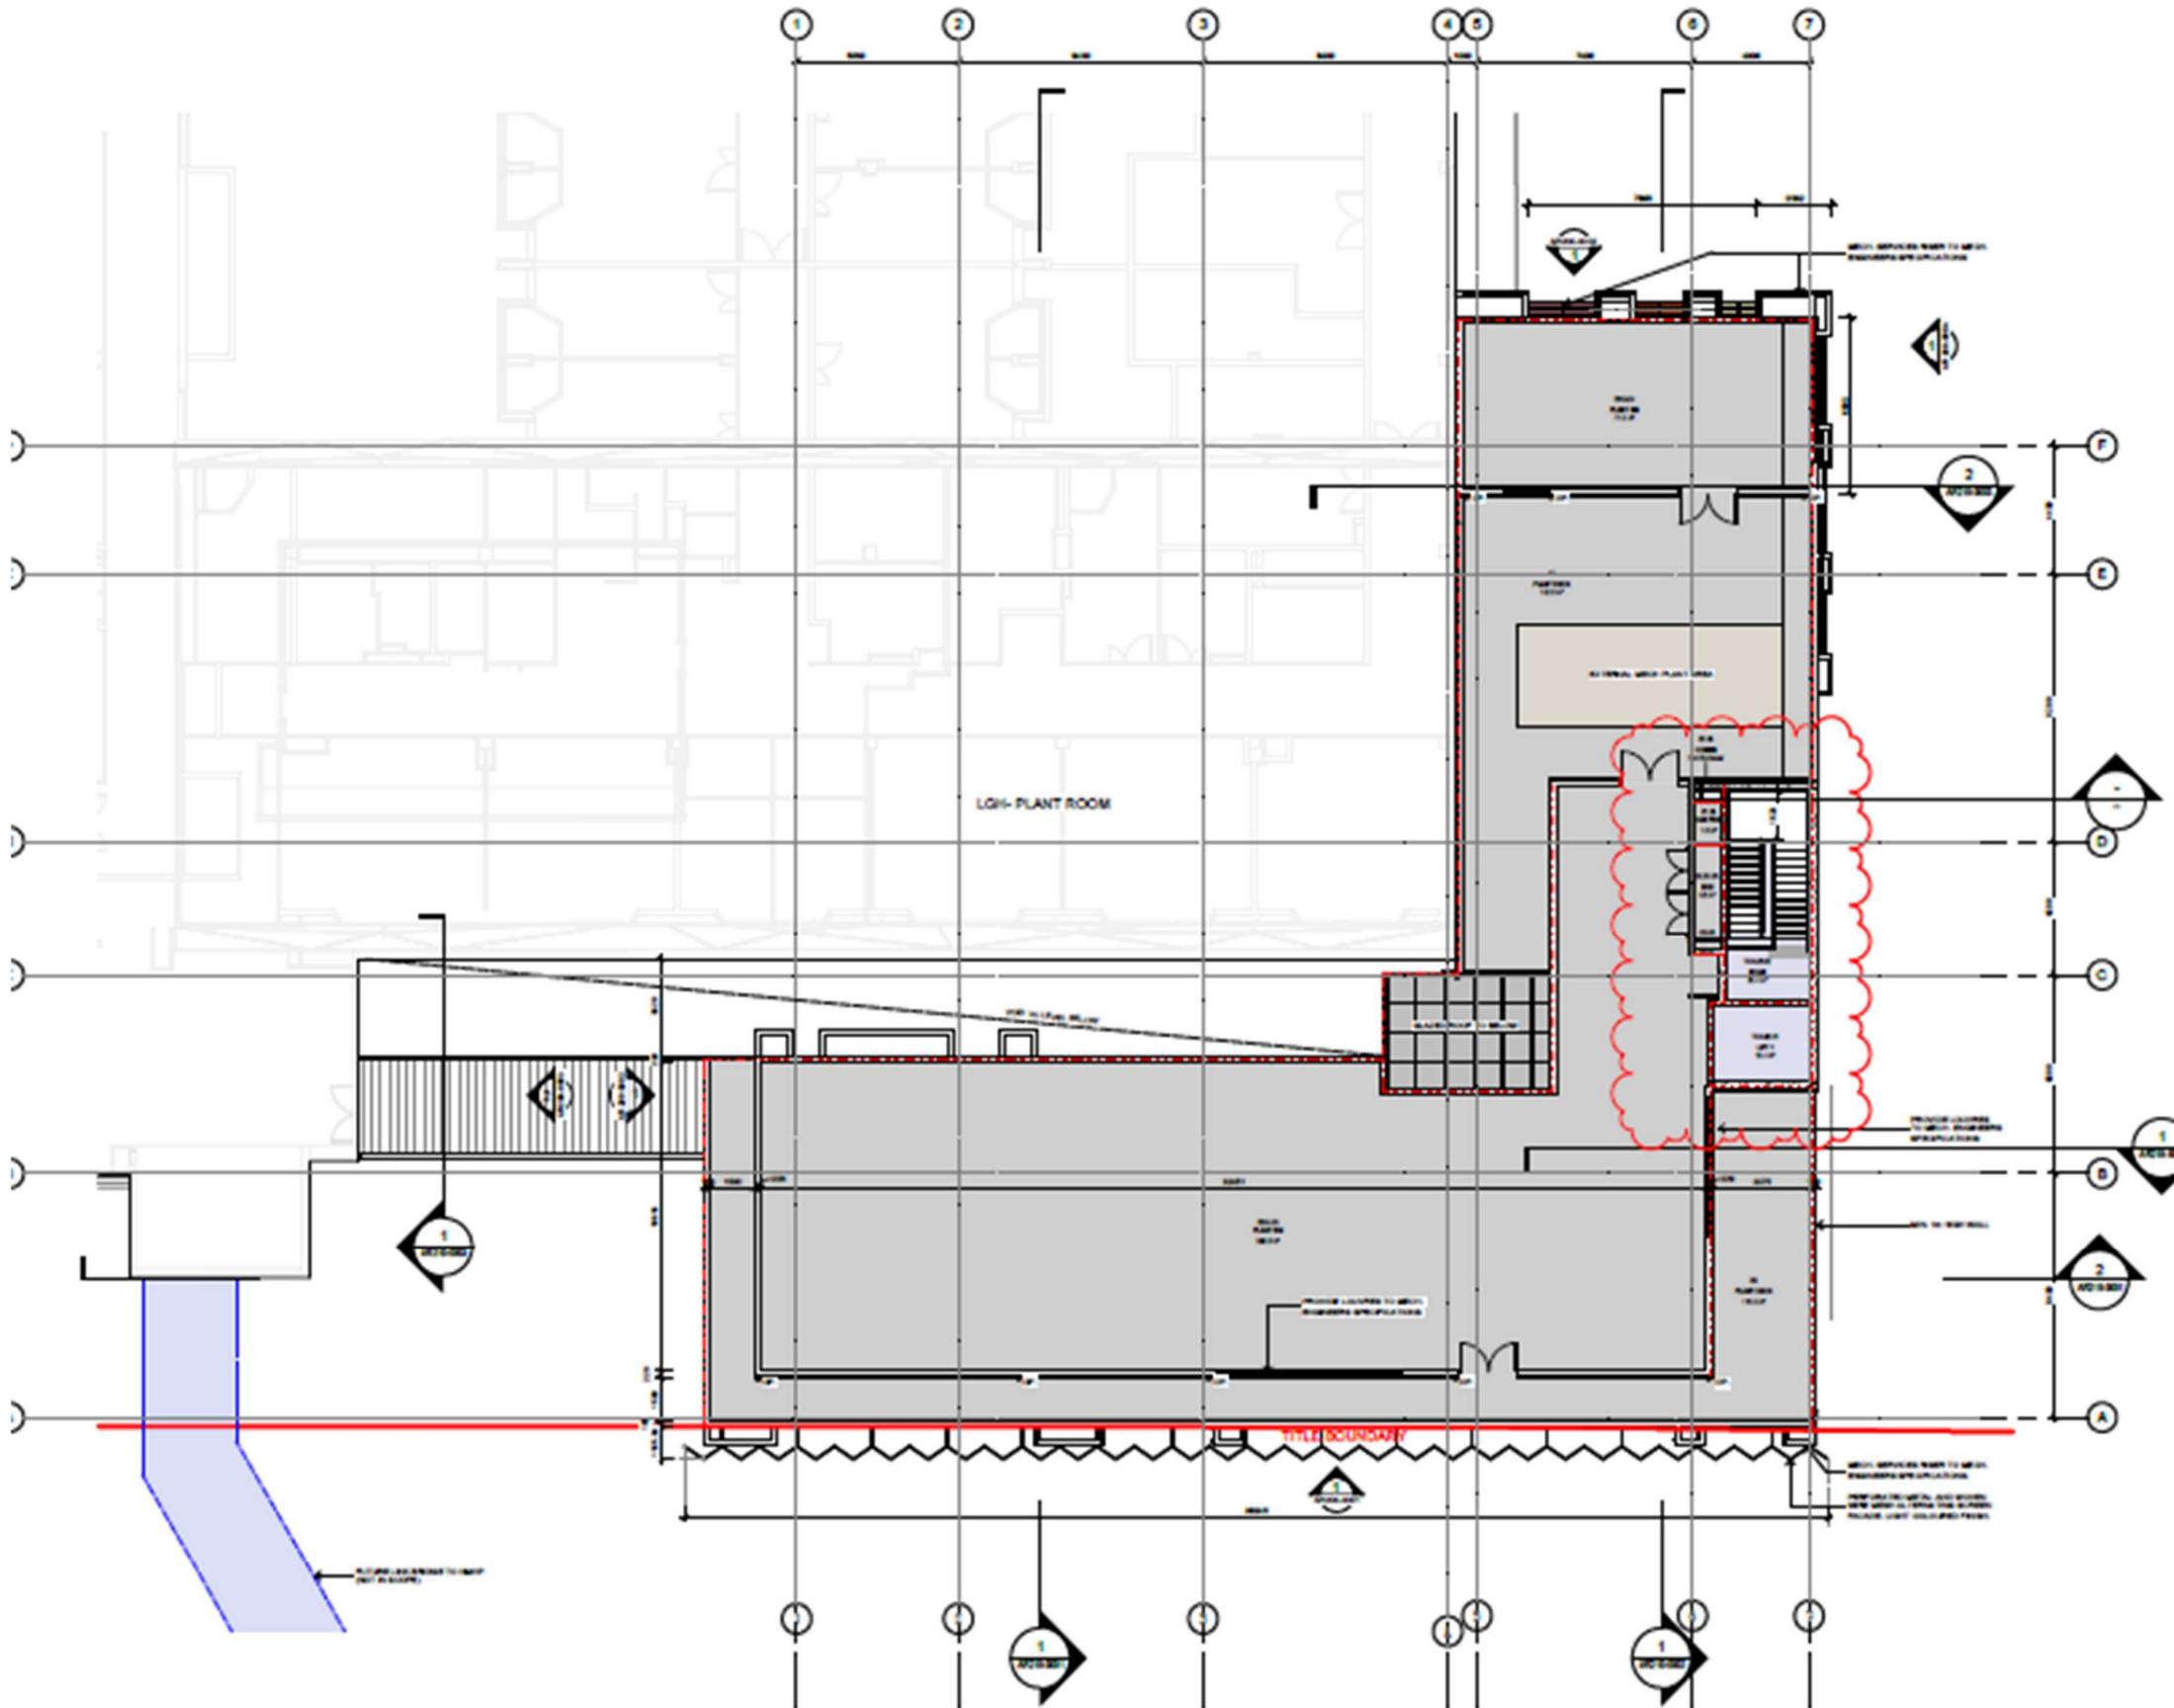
Northern Heart Centre Proposed Floor Plan – Level 6
